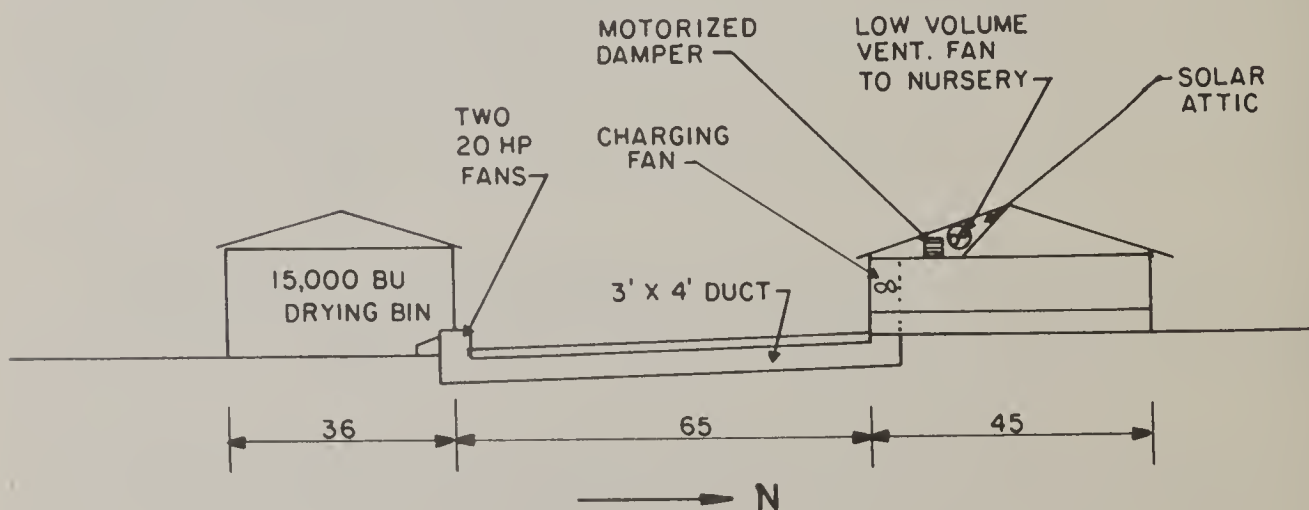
Cross section view of solar system and drying bins showing underground duct at the Lindsey farm.
